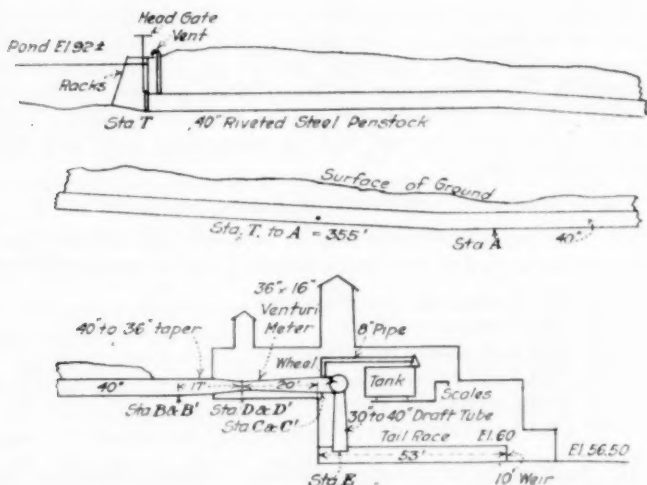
SKETCH OF ALDEN HYDRAULIC LABORATORY AND PENSTOCK, WORCESTER POLYTECHNIC INSTITUTE
